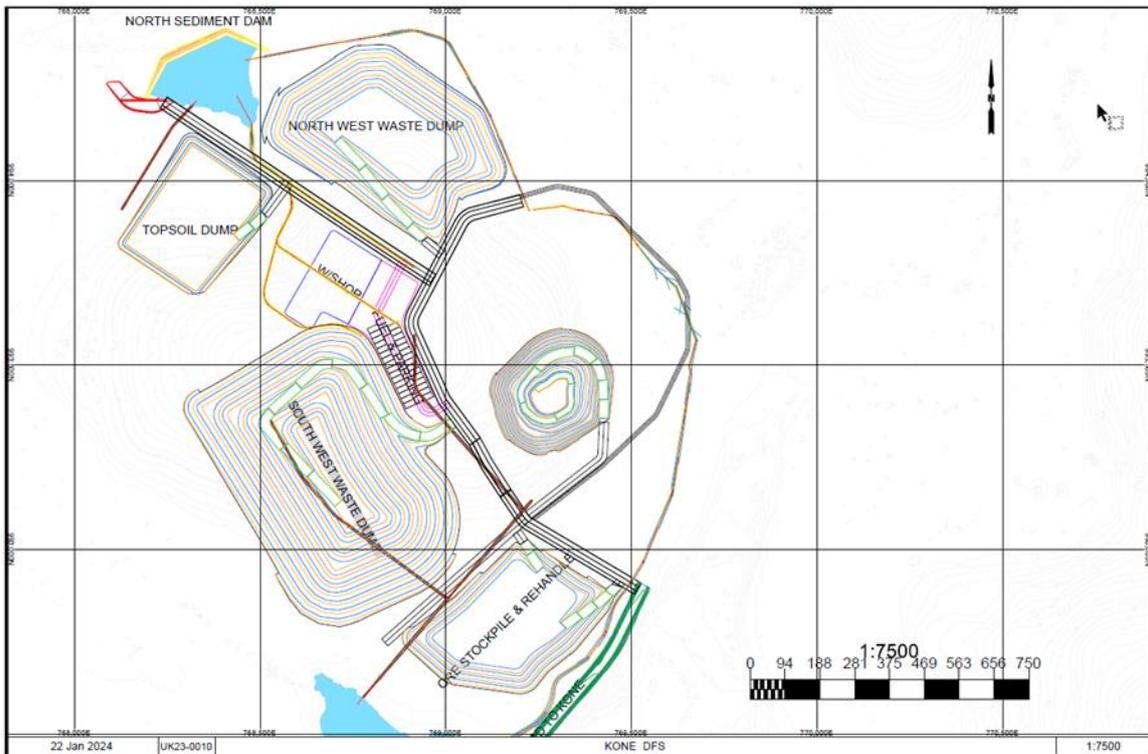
South Pit Cutback 2 Engineered Design
